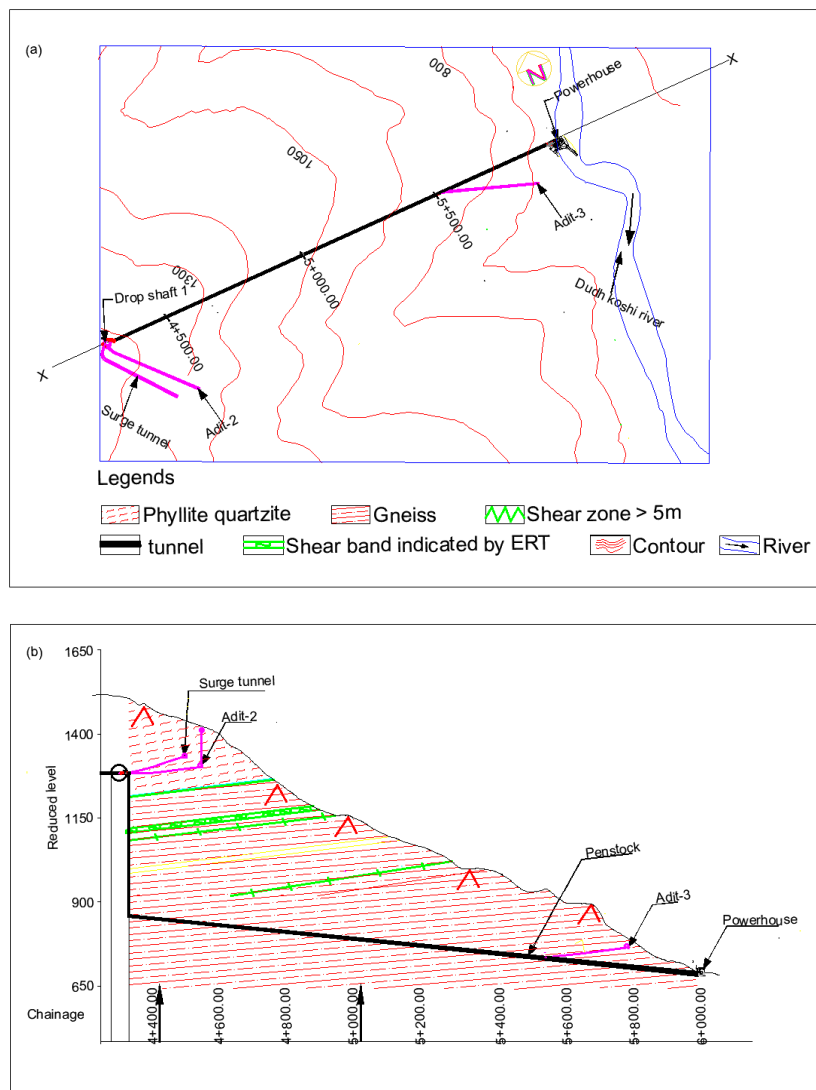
Penstock alignment a) Layout; b) Longitudinal section along X-X (Alternative 2)
